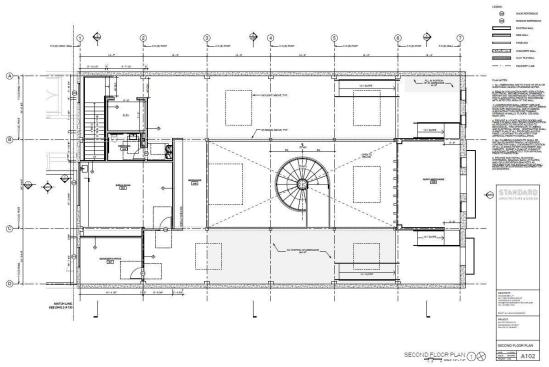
Proposed second (mezzanine) floor plan. Source: Standard, "Blu Dot Palo Alto" (November 2, 2021), Sheet A102.
